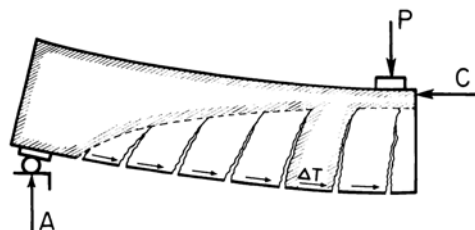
A view of concrete teeth and compression zone as the backbone of the concrete comb
